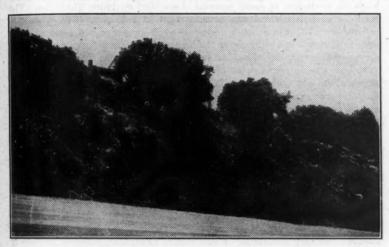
View of Slope, Approach to the Broadway Tunnel, in 1941
